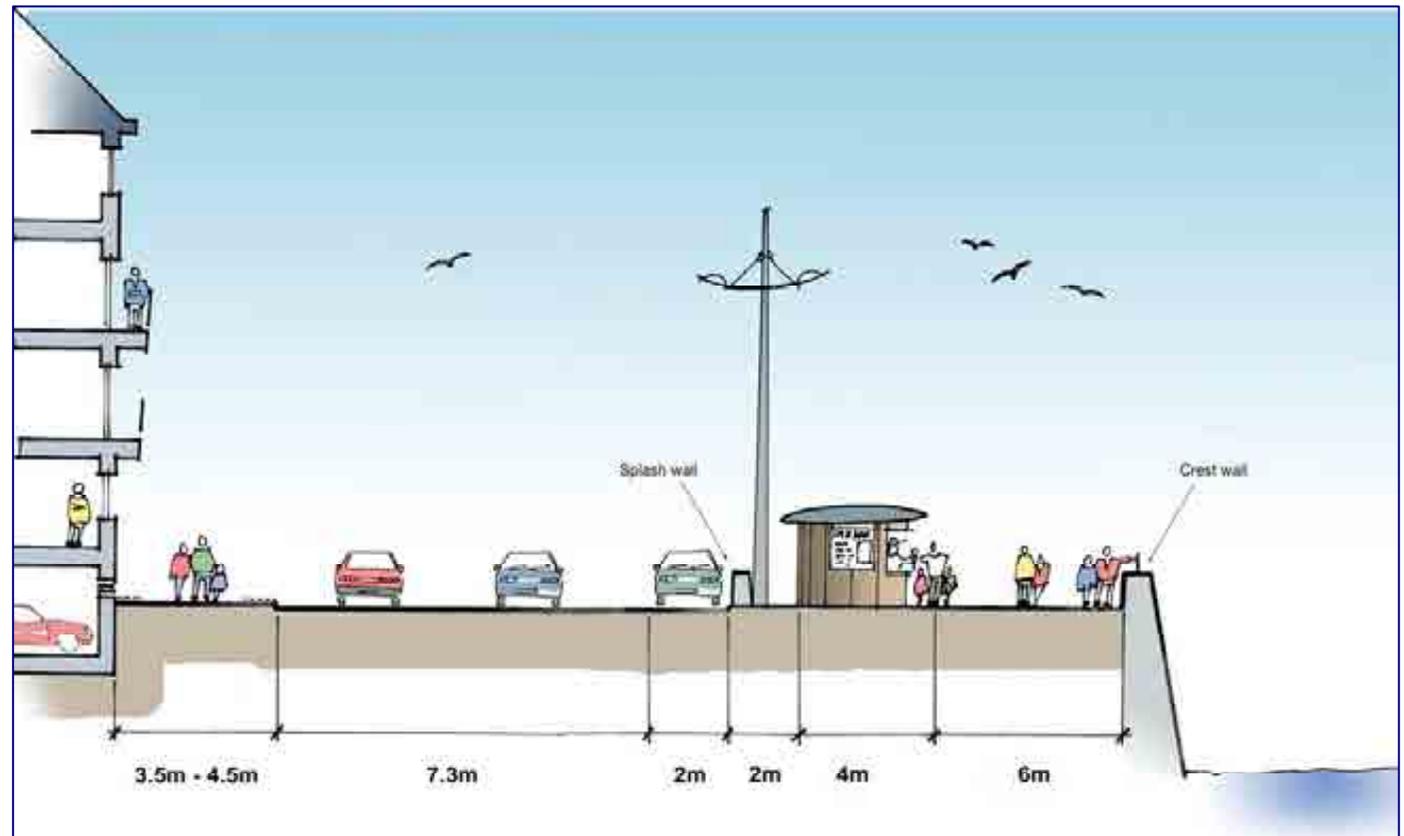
Cross section showing indicative layout of the Eastern Promenade, including a wide pedestrian route on both sides of the road, and on street parking
